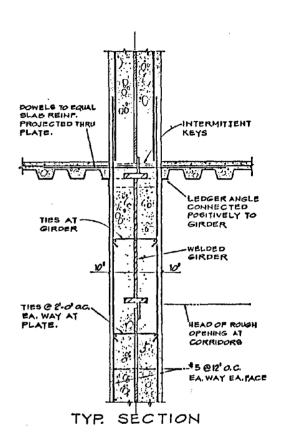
Steel plated shear wall details, Moffitt Hospital.
